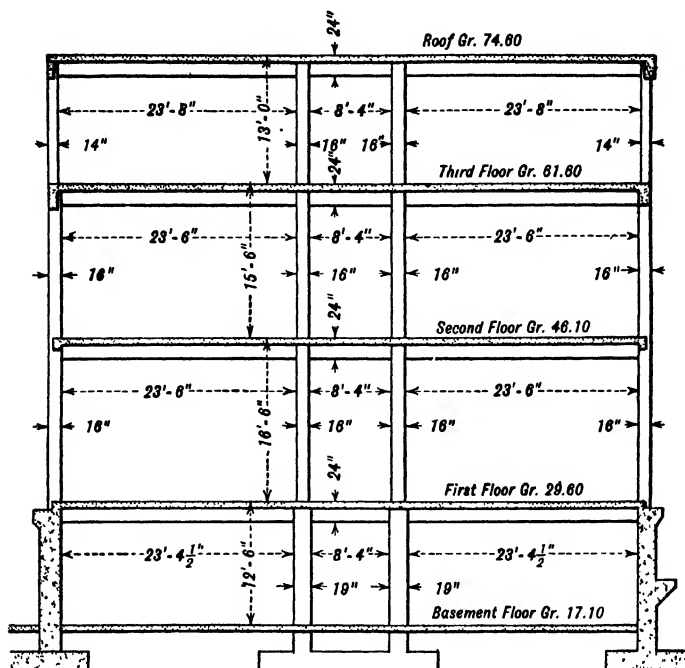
Typical Cross Section Showing Classrooms Opening on Corridor.
